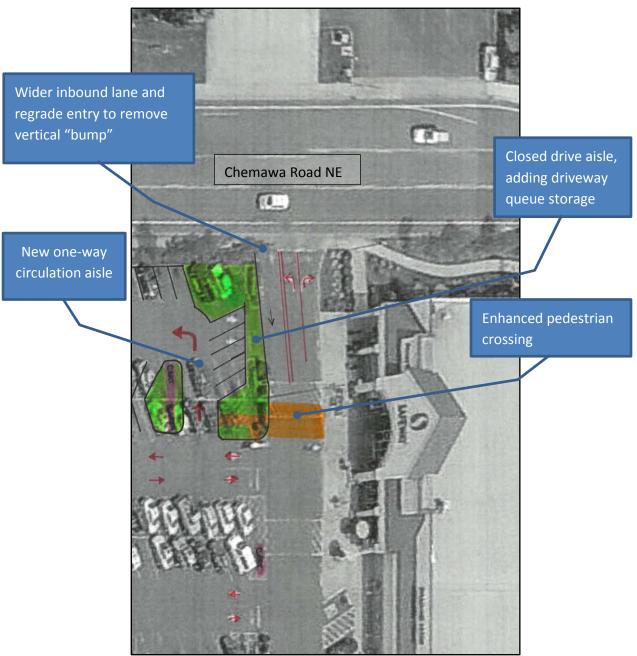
Chemawa Road Widening and Reconfiguration Concept
